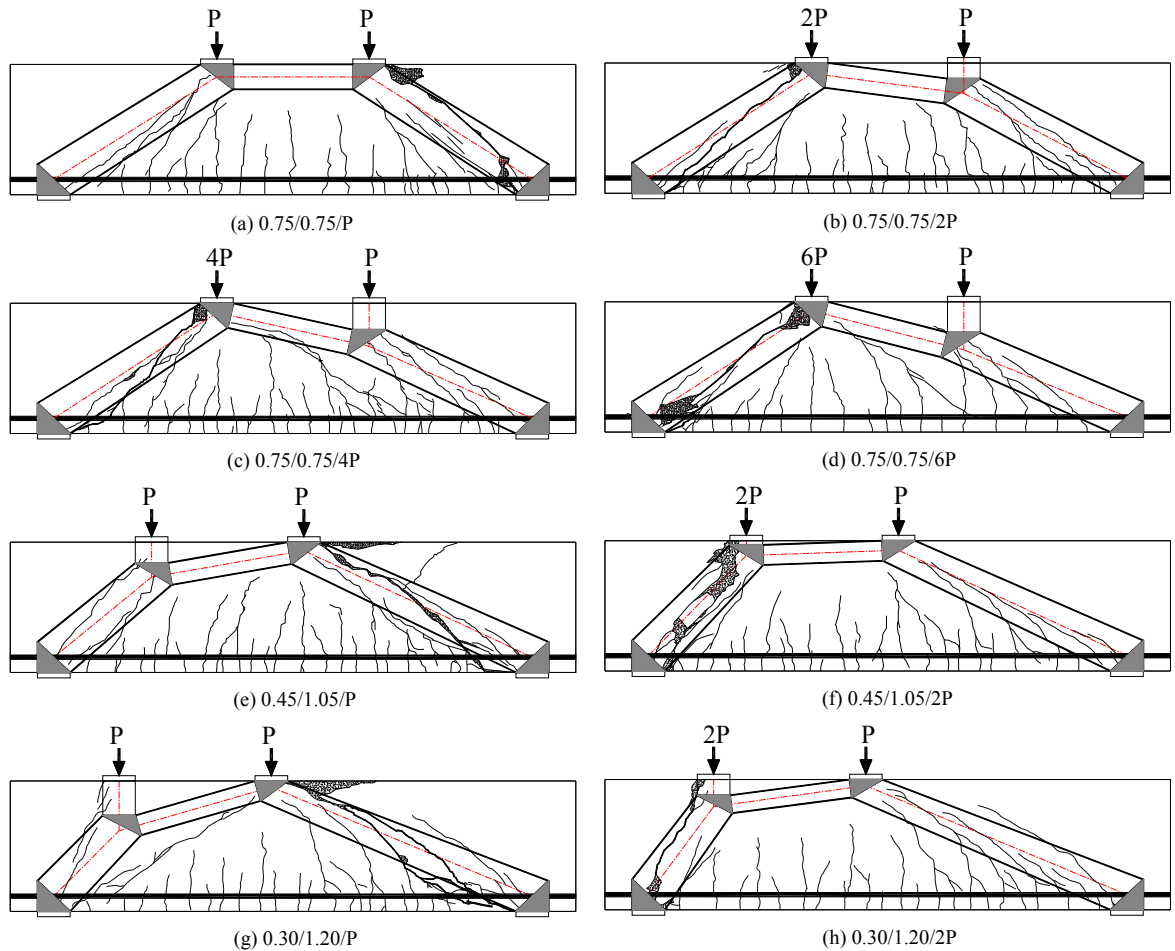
Strut-and-Tie model and cracks pattern of tested specimens
